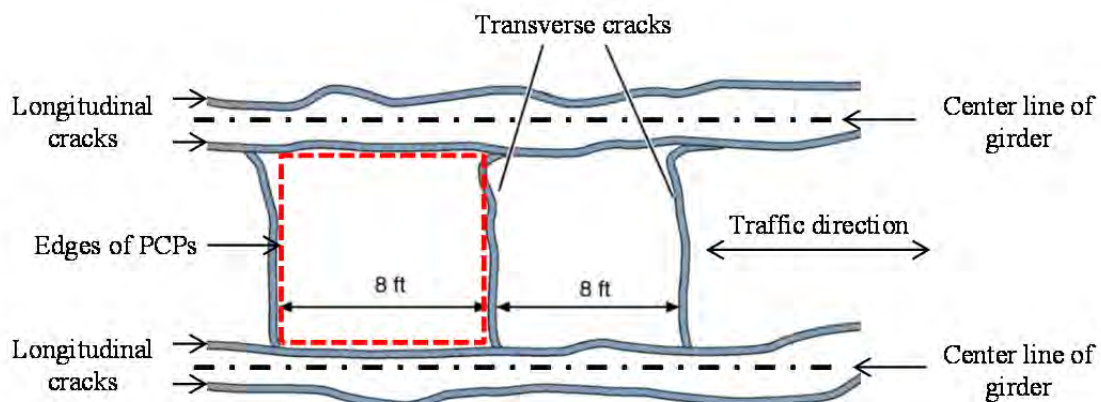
Reflected cracking in top surface of CIP-PCP bridge deck (Folliard *et al.* 2003)
